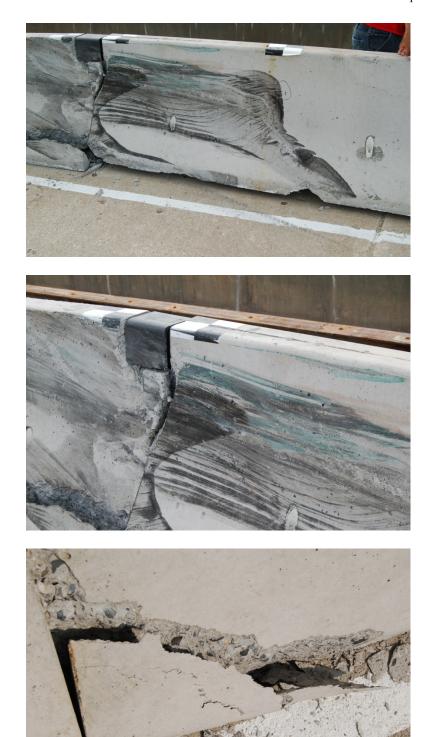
Barrier No. 4 Damage, Test No. NYTCB-5
